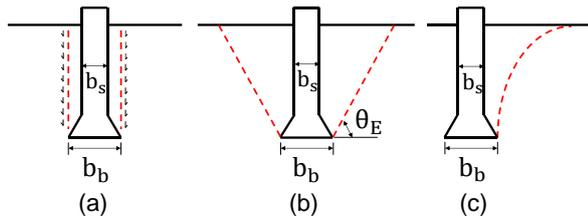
Assumed failure mechanisms for belled piles subject to uplift loads.
